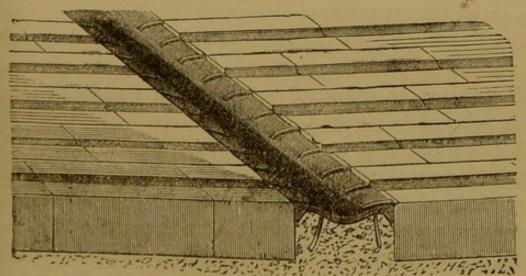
Floor laid with the Paving-brick shown in Fig. 38 (St. Parcras).
